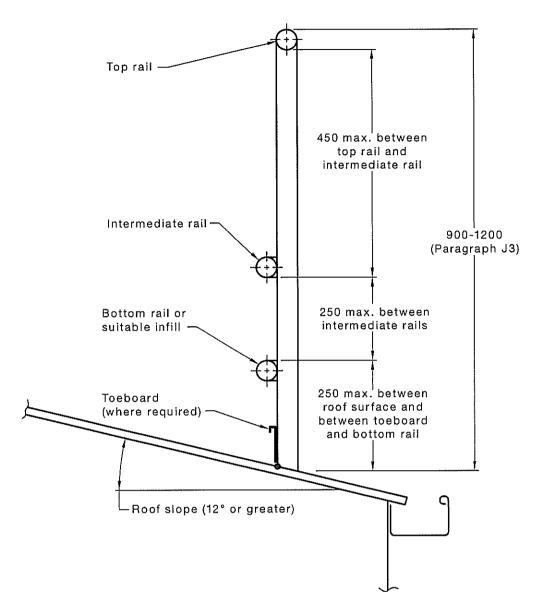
INSTALLATION OF GUARDRAILING ON THE SIDE OF A TRANSVERSE WALKWAY WHERE THE ANGLE OF SLOPE IS 12° OR GREATER
